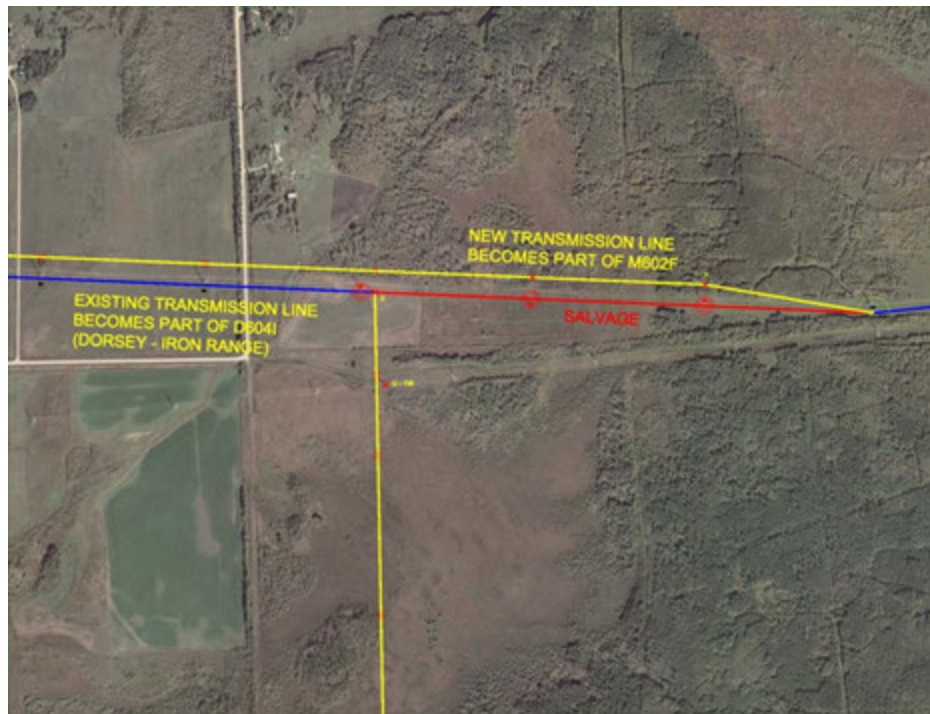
Eastern Modifications to M602F using a portion of new tower construction for its line
